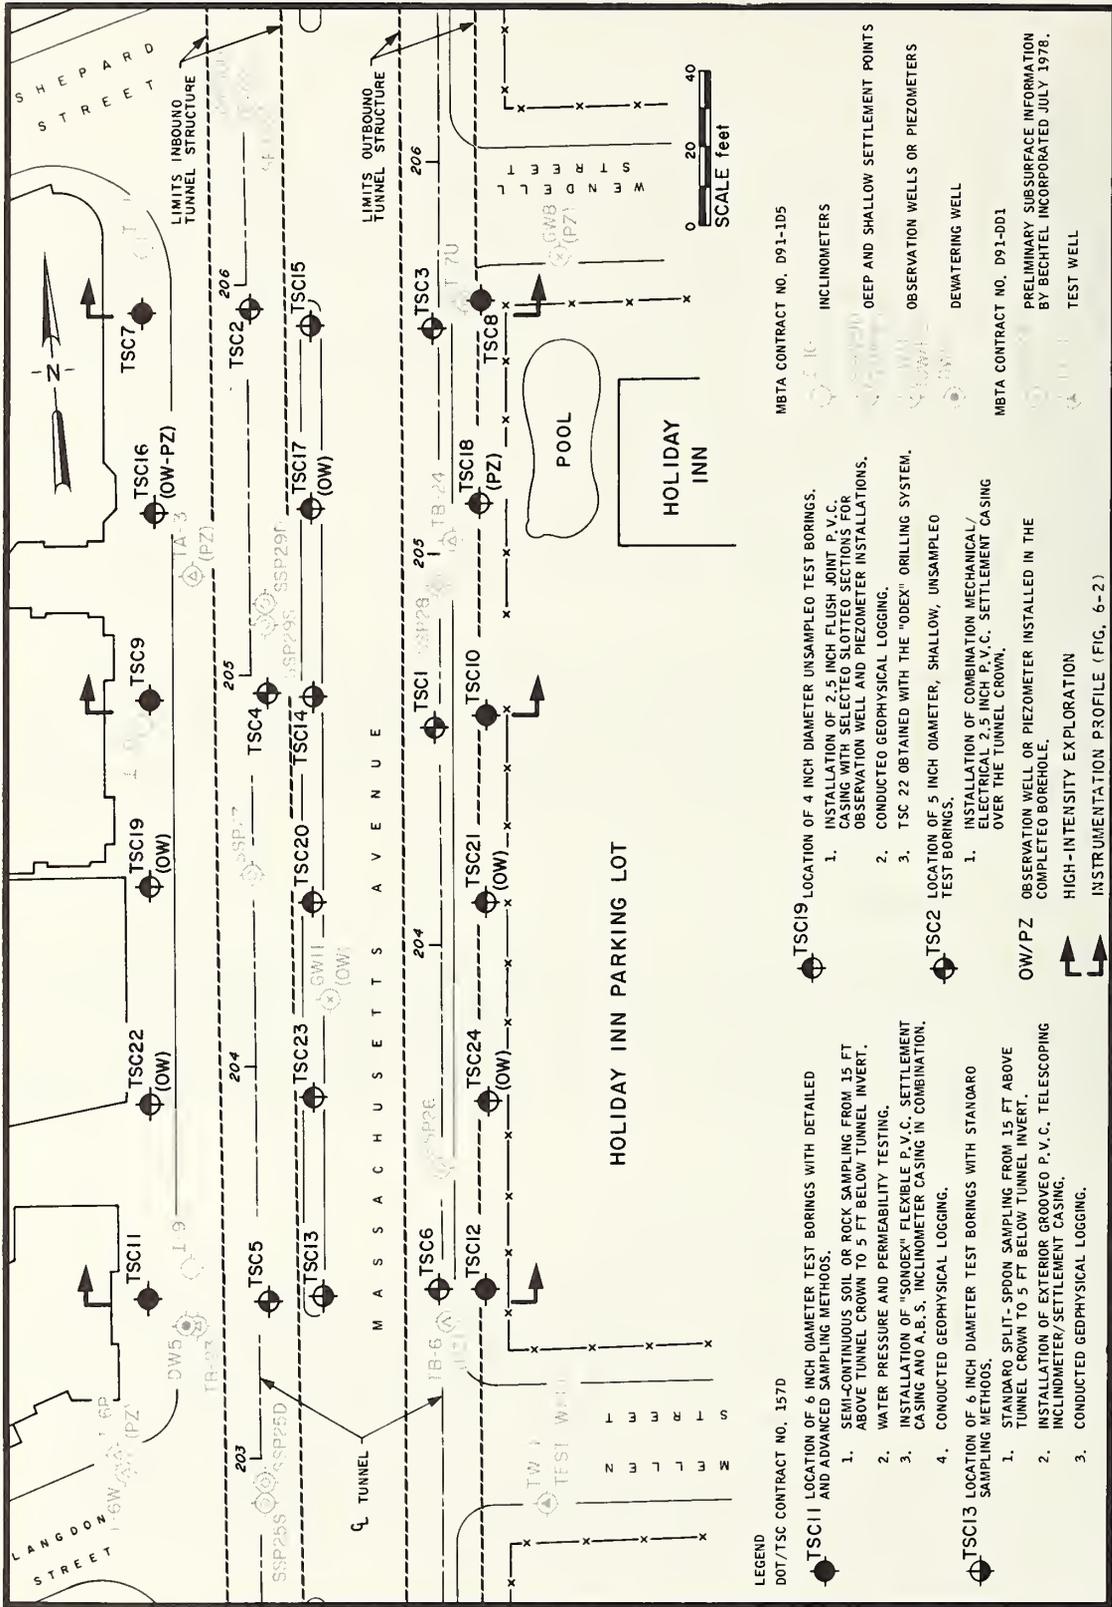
SUBSURFACE EXPLORATION PLAN, HOLIDAY INN SITE, CAMBRIDGE, MASSACHUSETTS
